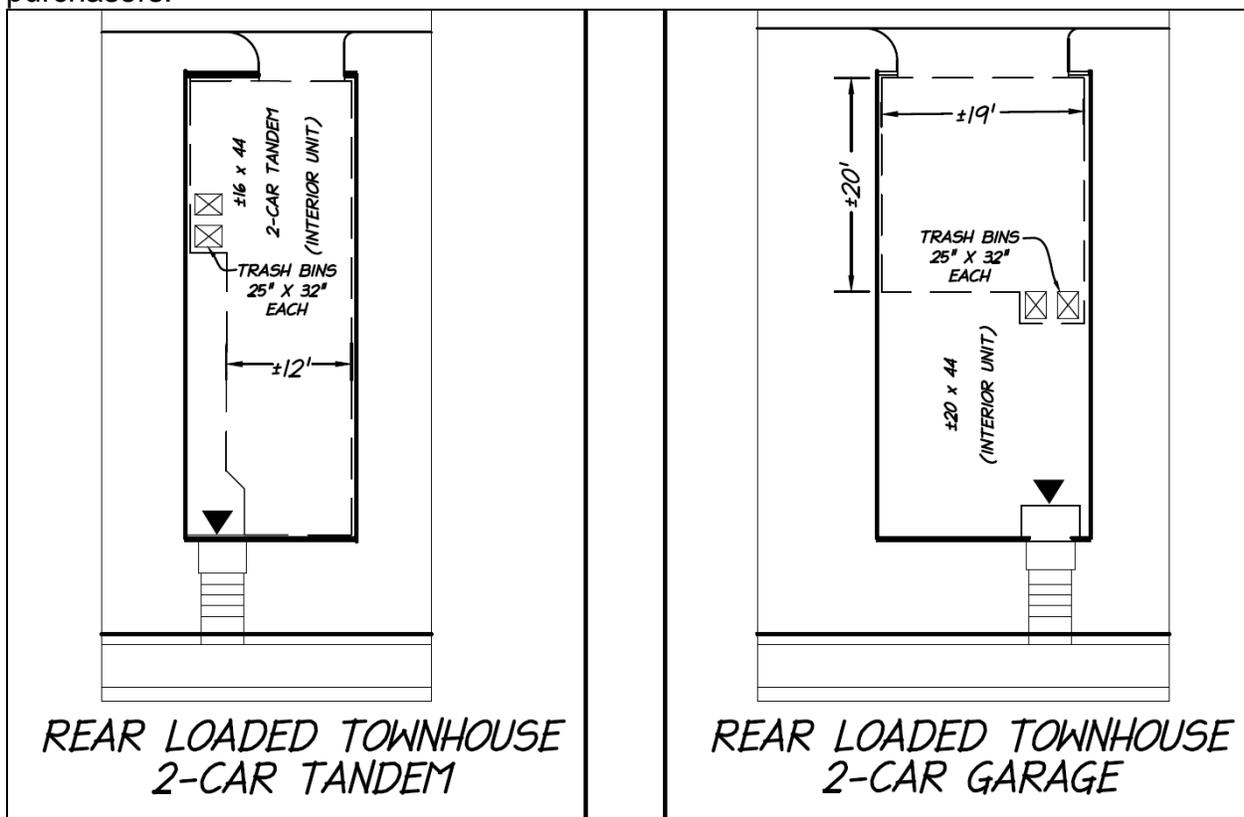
Proposed Garage Layouts (Source: DPA/ PCA/GDP, Sheet 5A)
